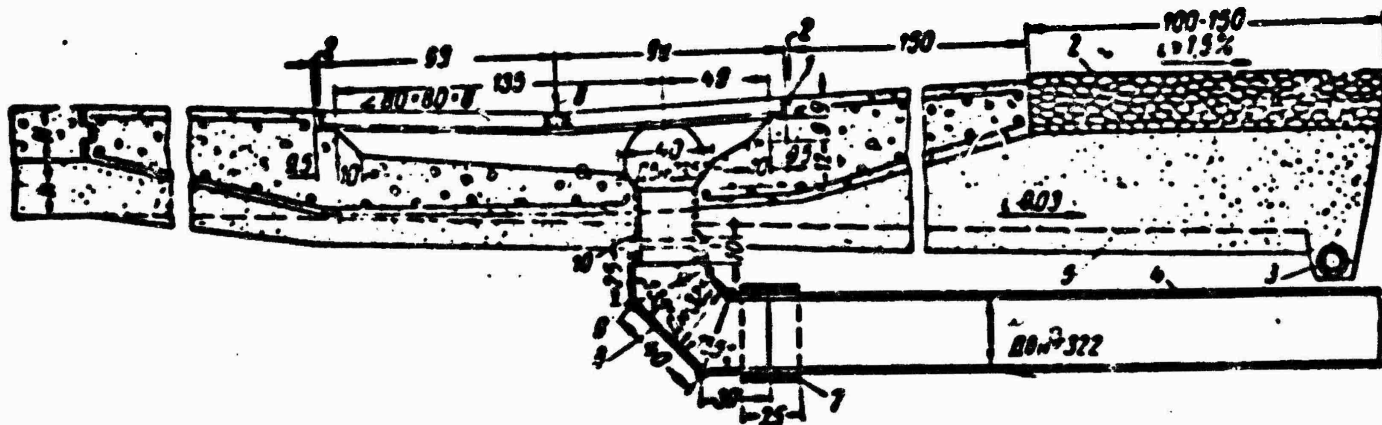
Storm sewer. 1) Sealing with cement grout (1:3); 2) impregnating with bitumen (6-8 cm); 3) drain; 4) asbestos cement pipe; 5) surface of the trench bottom beneath the gutter slabs; 6) welded seams (along the perimeter); 7) reinforced bitumen joint or union; 8) an elbow welded from steel pipes; 9) bituminous yarn; 10) bitumen mastic. a) Dvn; b) dn.
